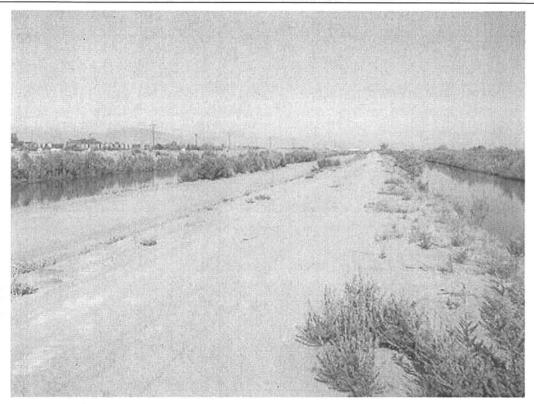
Central Main Canal at left and Dogwood Canal at right, separated by two unpaved roadways (one at higher elevation than the other).
